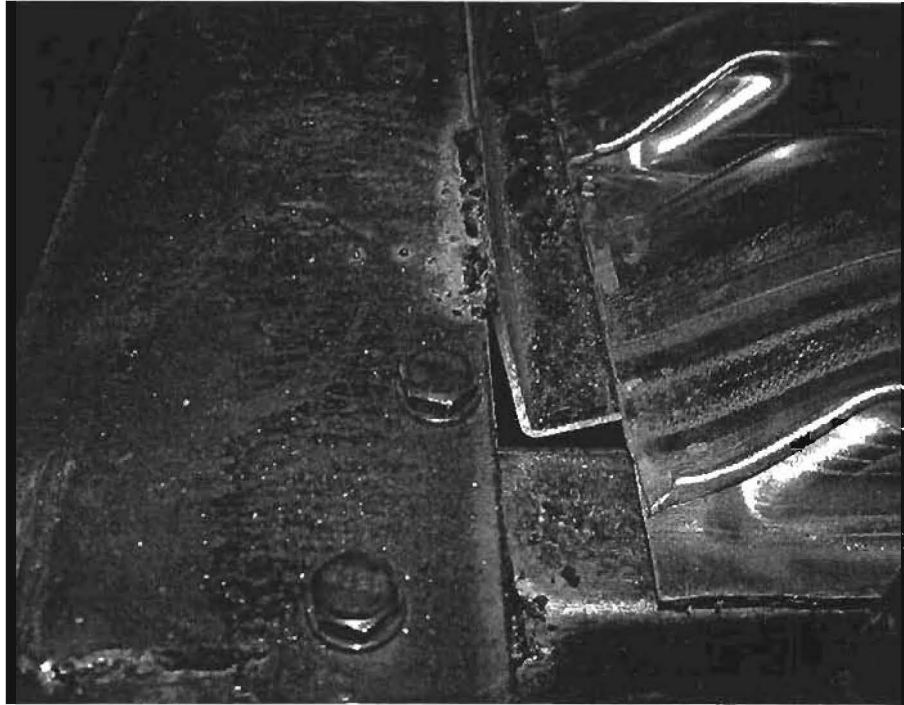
Photo of Deformed Support Angle after 20ga02.st16ft Failure Test
